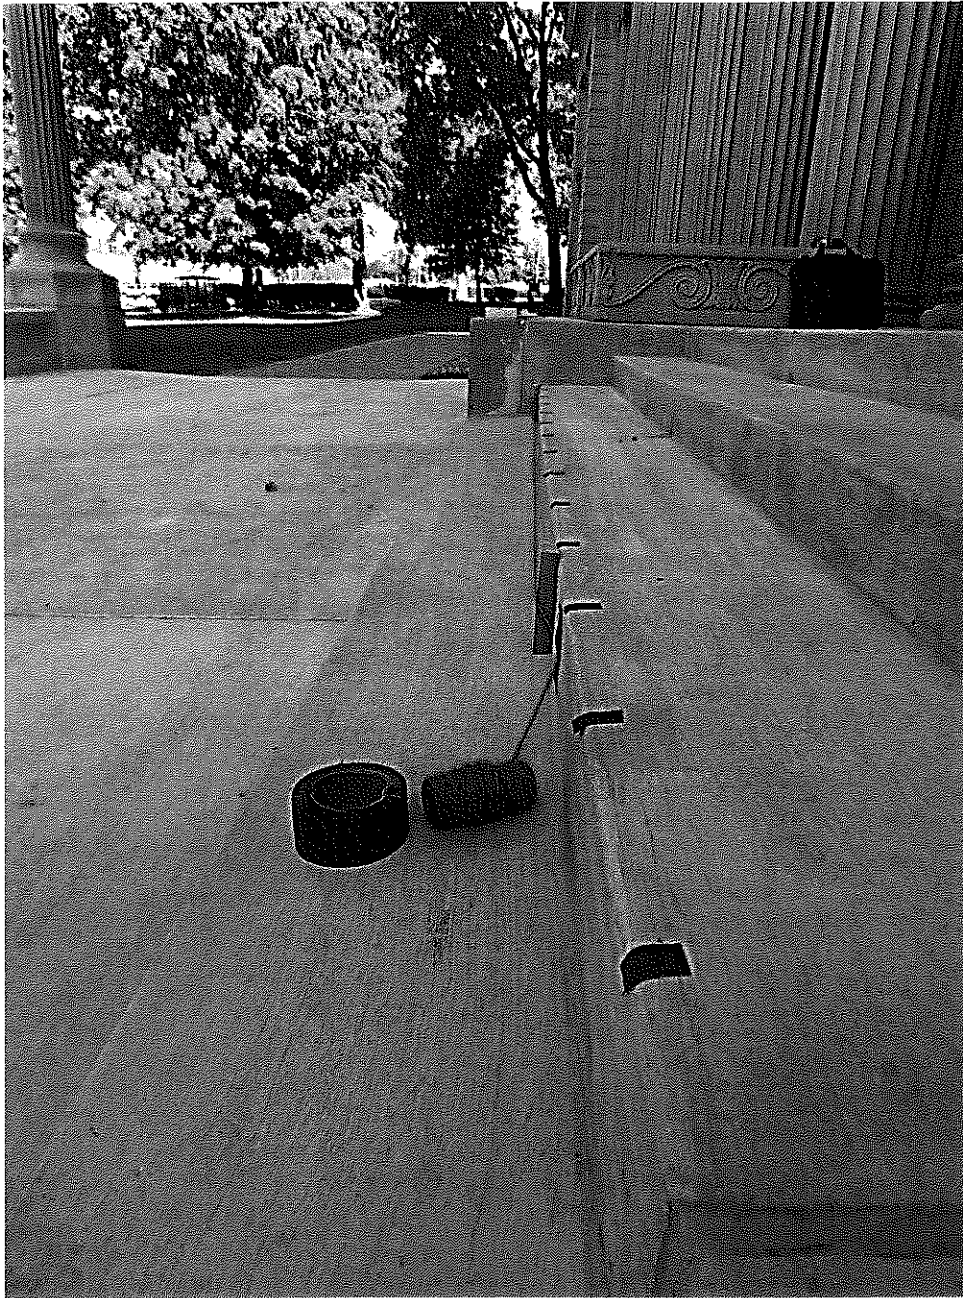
Overall photo at north section Stairway A, measurements of second riser
